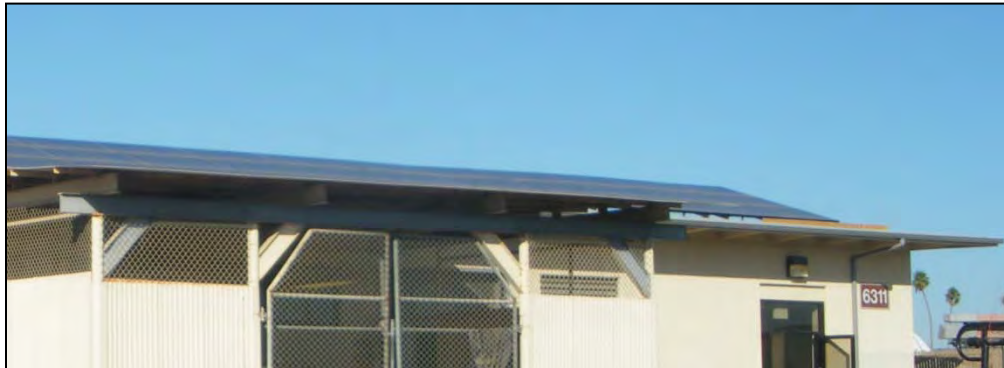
30 kW PV System installed on building 6311 (Credit: Samuel Booth, NREL)
